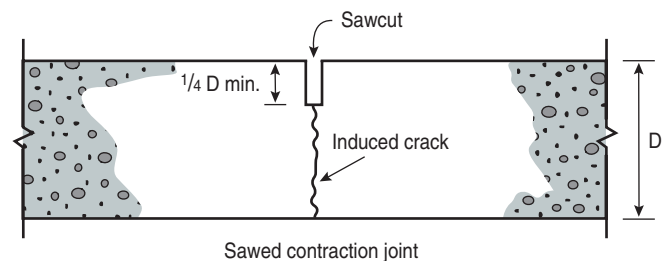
Contraction joints provide for horizontal movement in the plane of a slab or wall and induce controlled cracking caused by drying and thermal shrinkage.
